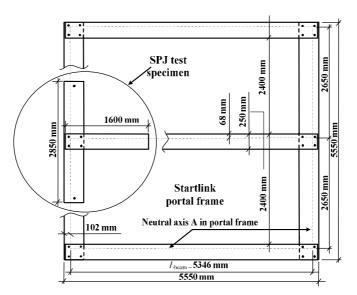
Startlink portal frame with specimen SPJ for external frame joint at first floor level.
